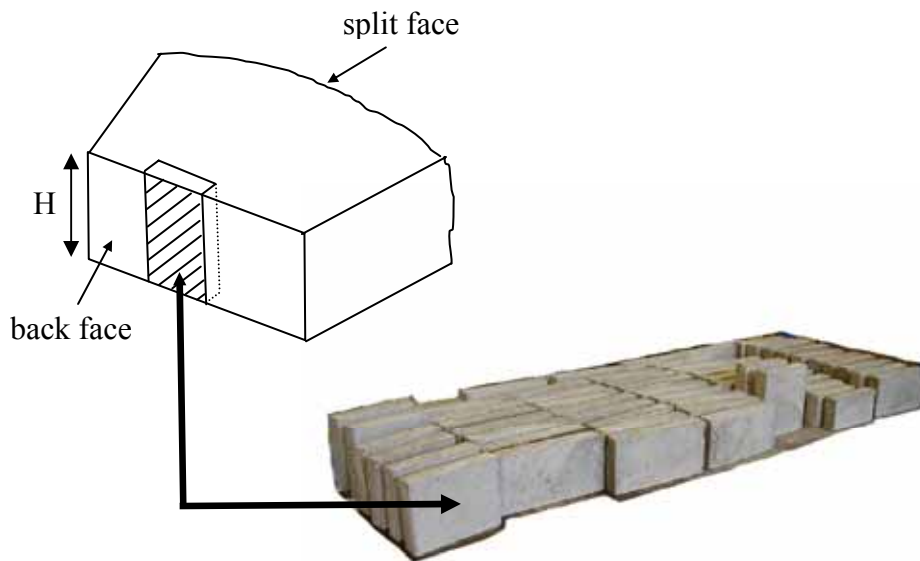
Drawing and photo. Definition of terms: test specimens (or coupons).
